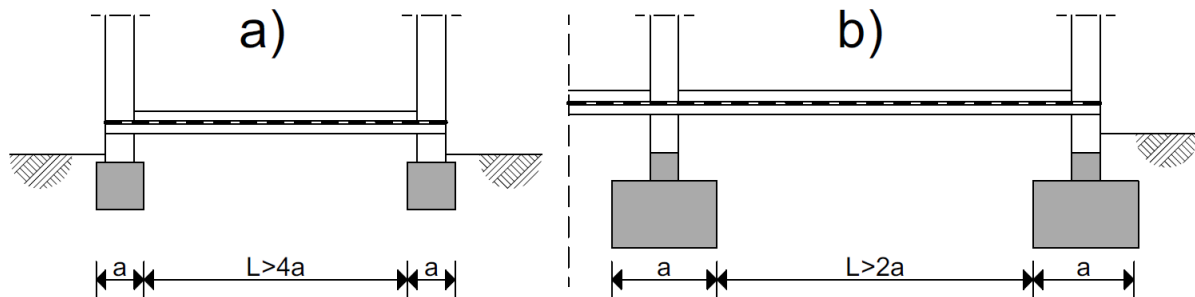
a) minimum distance between strip foundations, b) minimum distance between pad foundations
